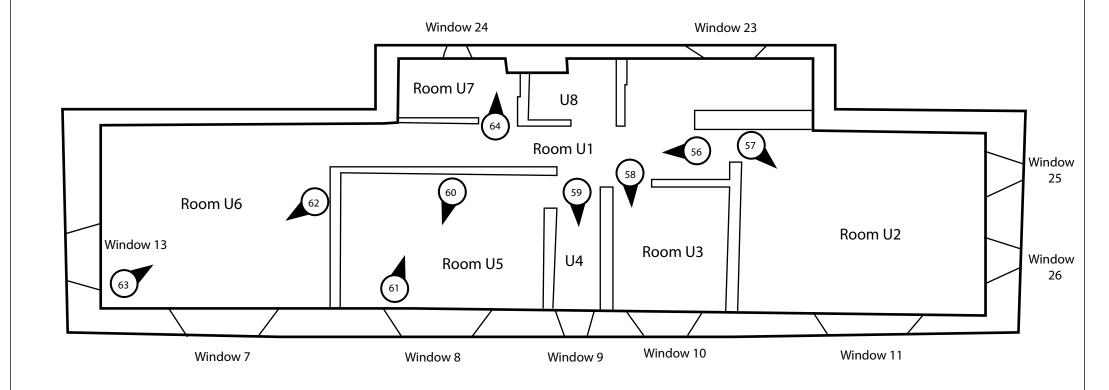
Photographic location plan of the interior, upper floor of the barn No 247 Abergele Road, Colwyn Bay.
